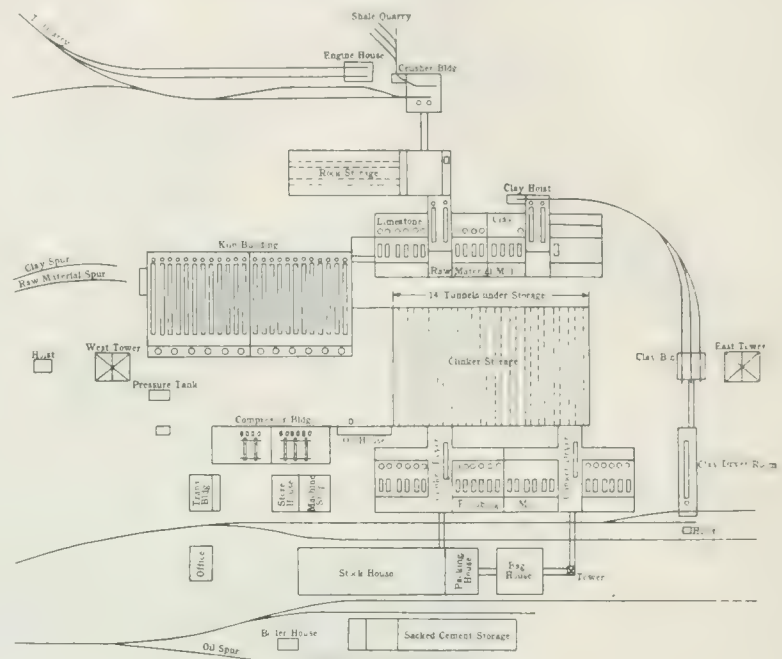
TYPICAL CEMENT MILL LAYOUT
